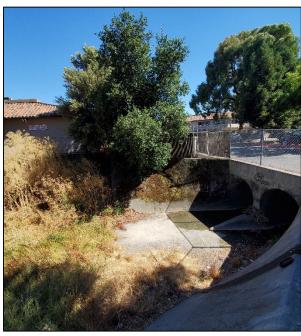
Concrete culvert at Pleasanton Canal (C-02)
